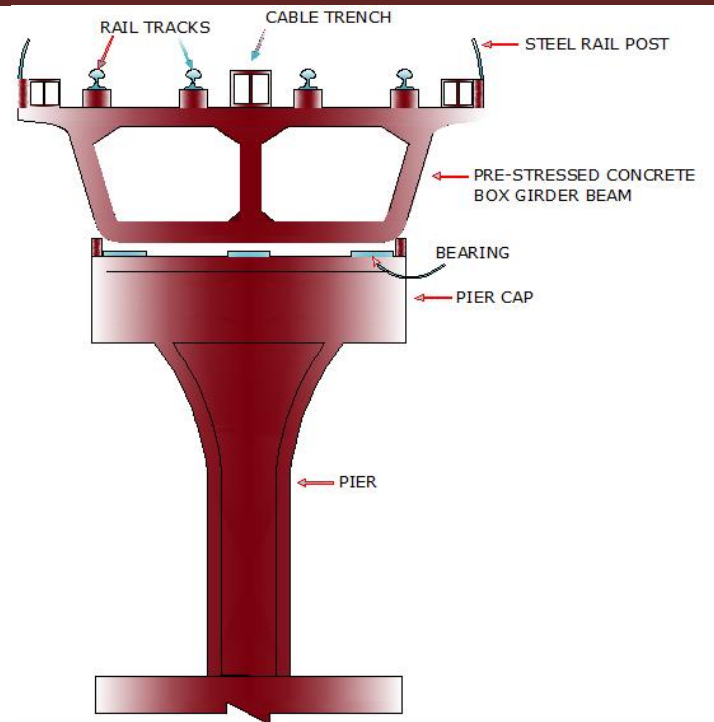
Typical cross-section of Double Cell, AA-LRT's Elevated structure
